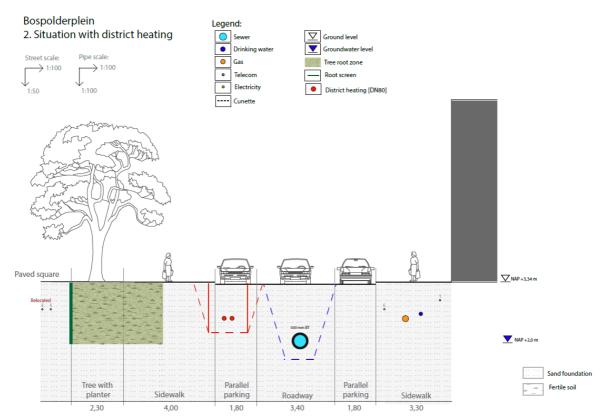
Cross-sectional view of the Bospolderplein-street – Situation 2: situation with district heating
